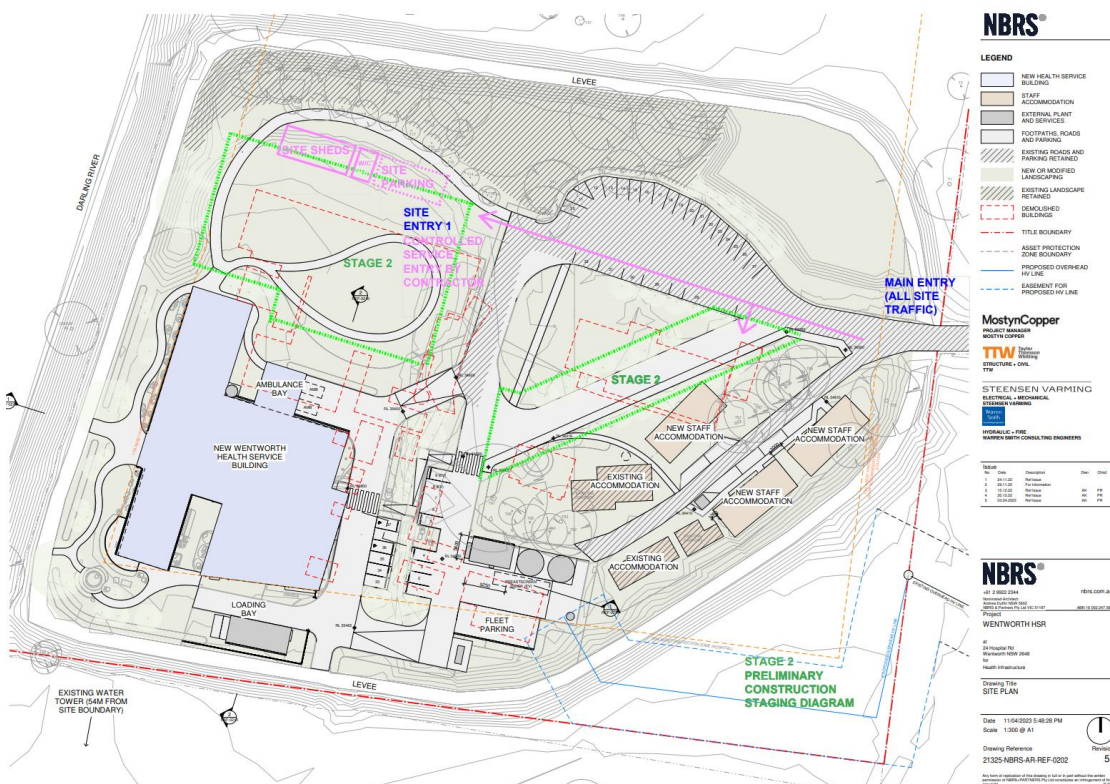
Stage 2 Preliminary Construction Traffic Management Plan (MostynCopper and SCT)
